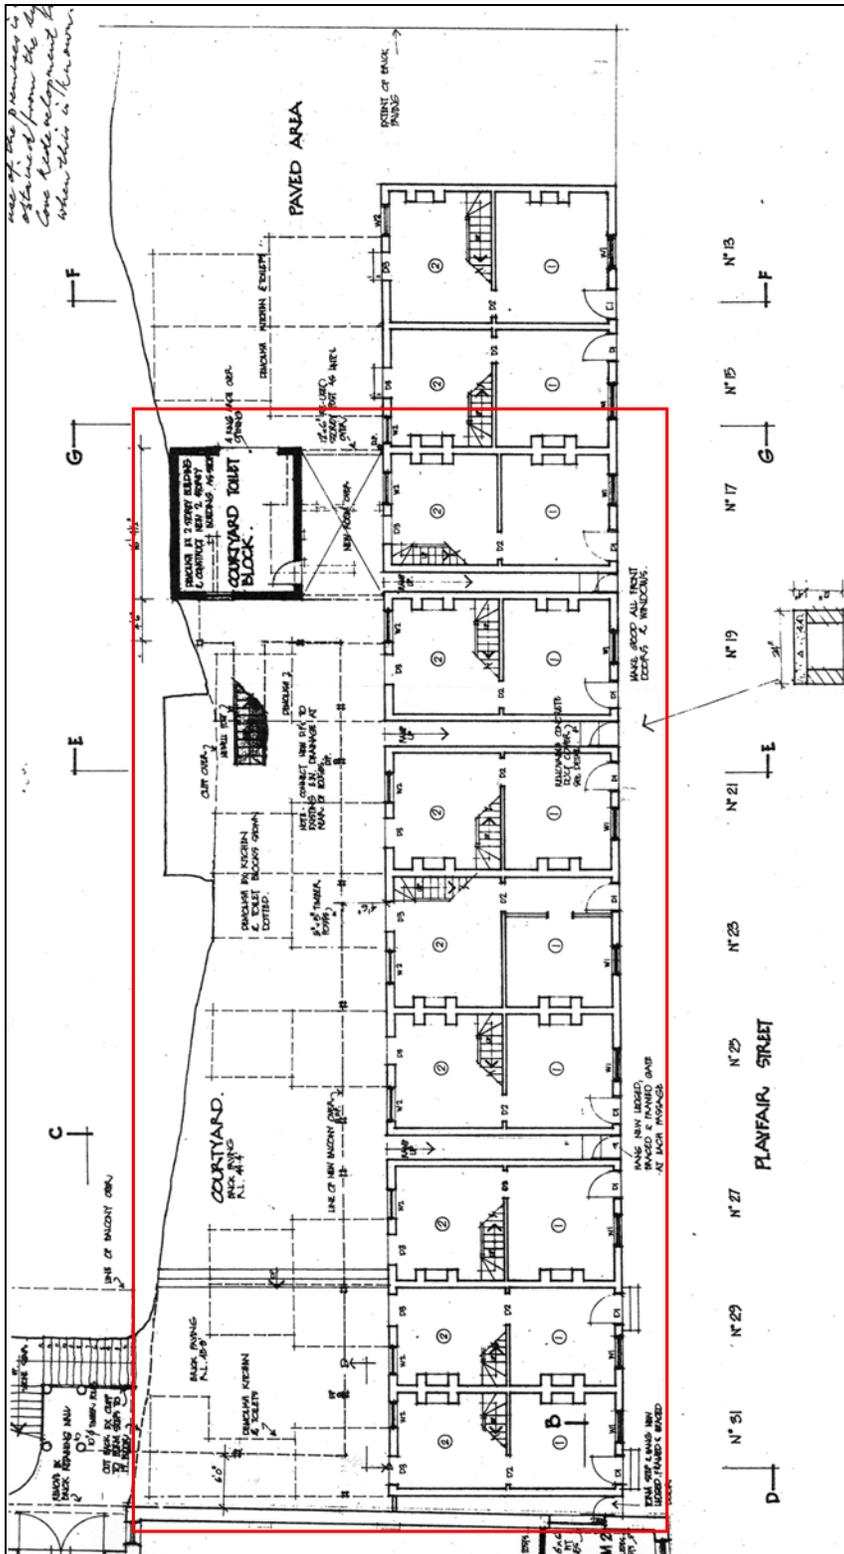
Ground Floor Plan prepared by Fisher Jackson Hudson Architects showing the proposed 1970s works. The outline of the rear wings and annexes are shown dotted. Note the proposed courtyard toilet block.
